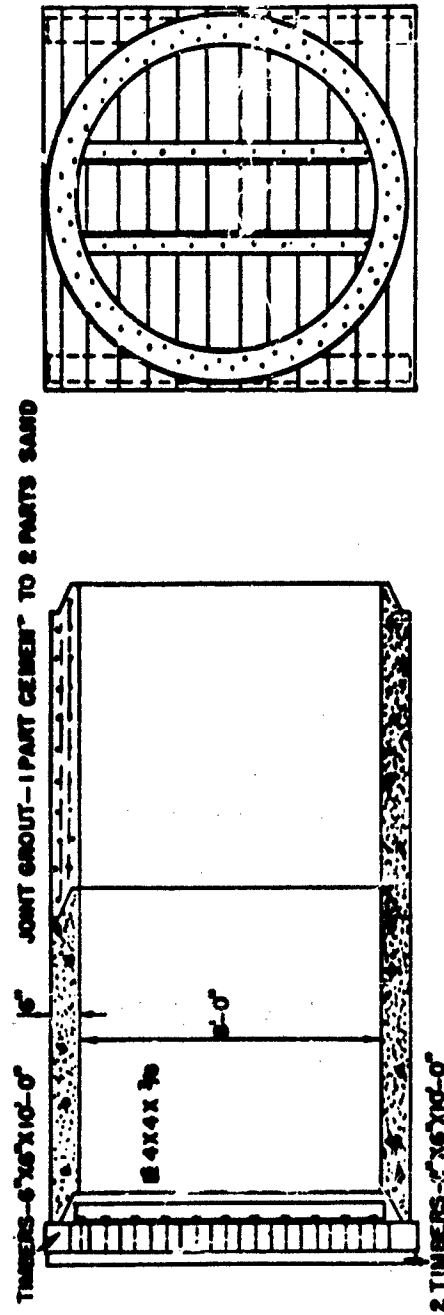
Tested circular concrete section. The section which met standard Specification ASTM 75-55 weighs $1\frac{1}{2}$ tons per foot of length.
